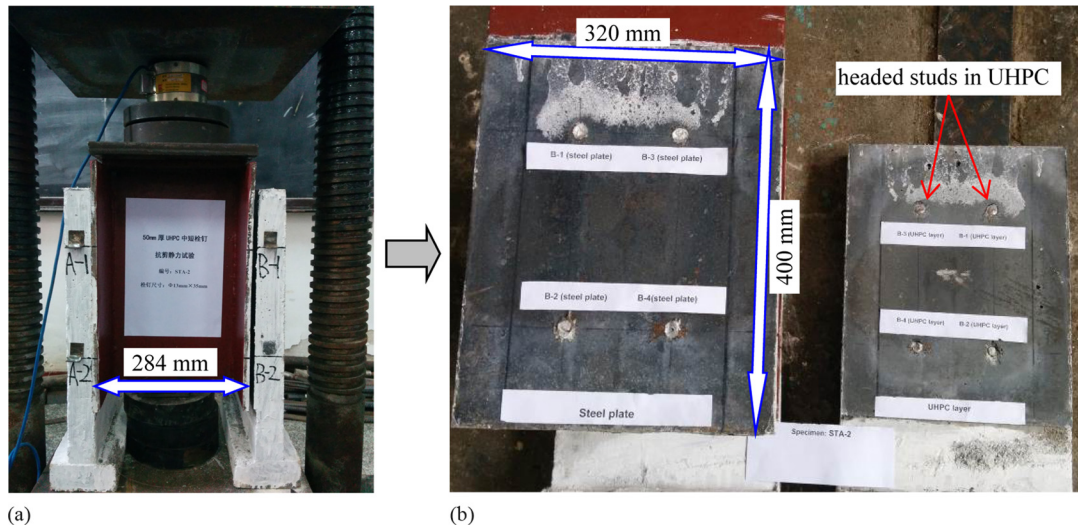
Failure mode of specimen in the static tests: (a) front view of the specimen; (b) two separated parts
